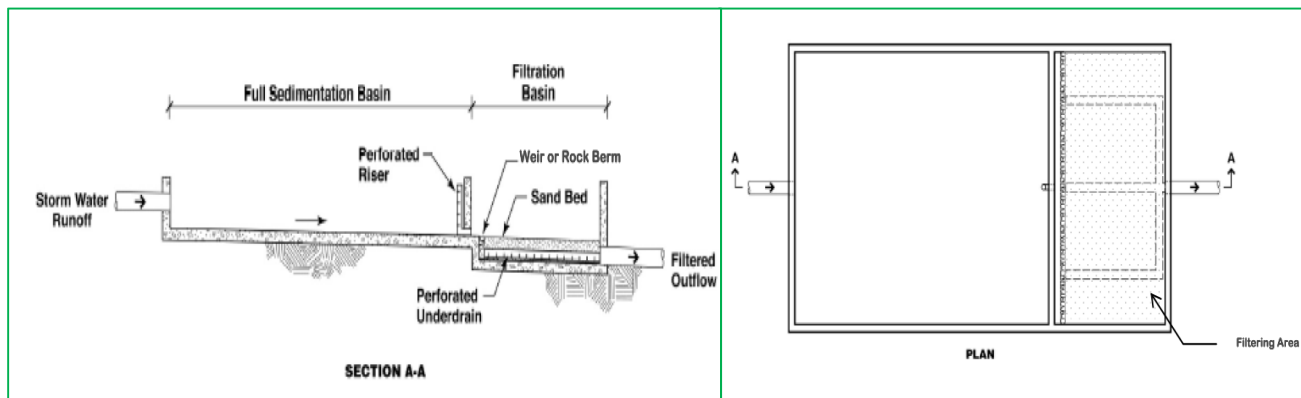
SAND FILTER DESIGN SECTION (LEFT) AND PLAN VIEW (RIGHT)
